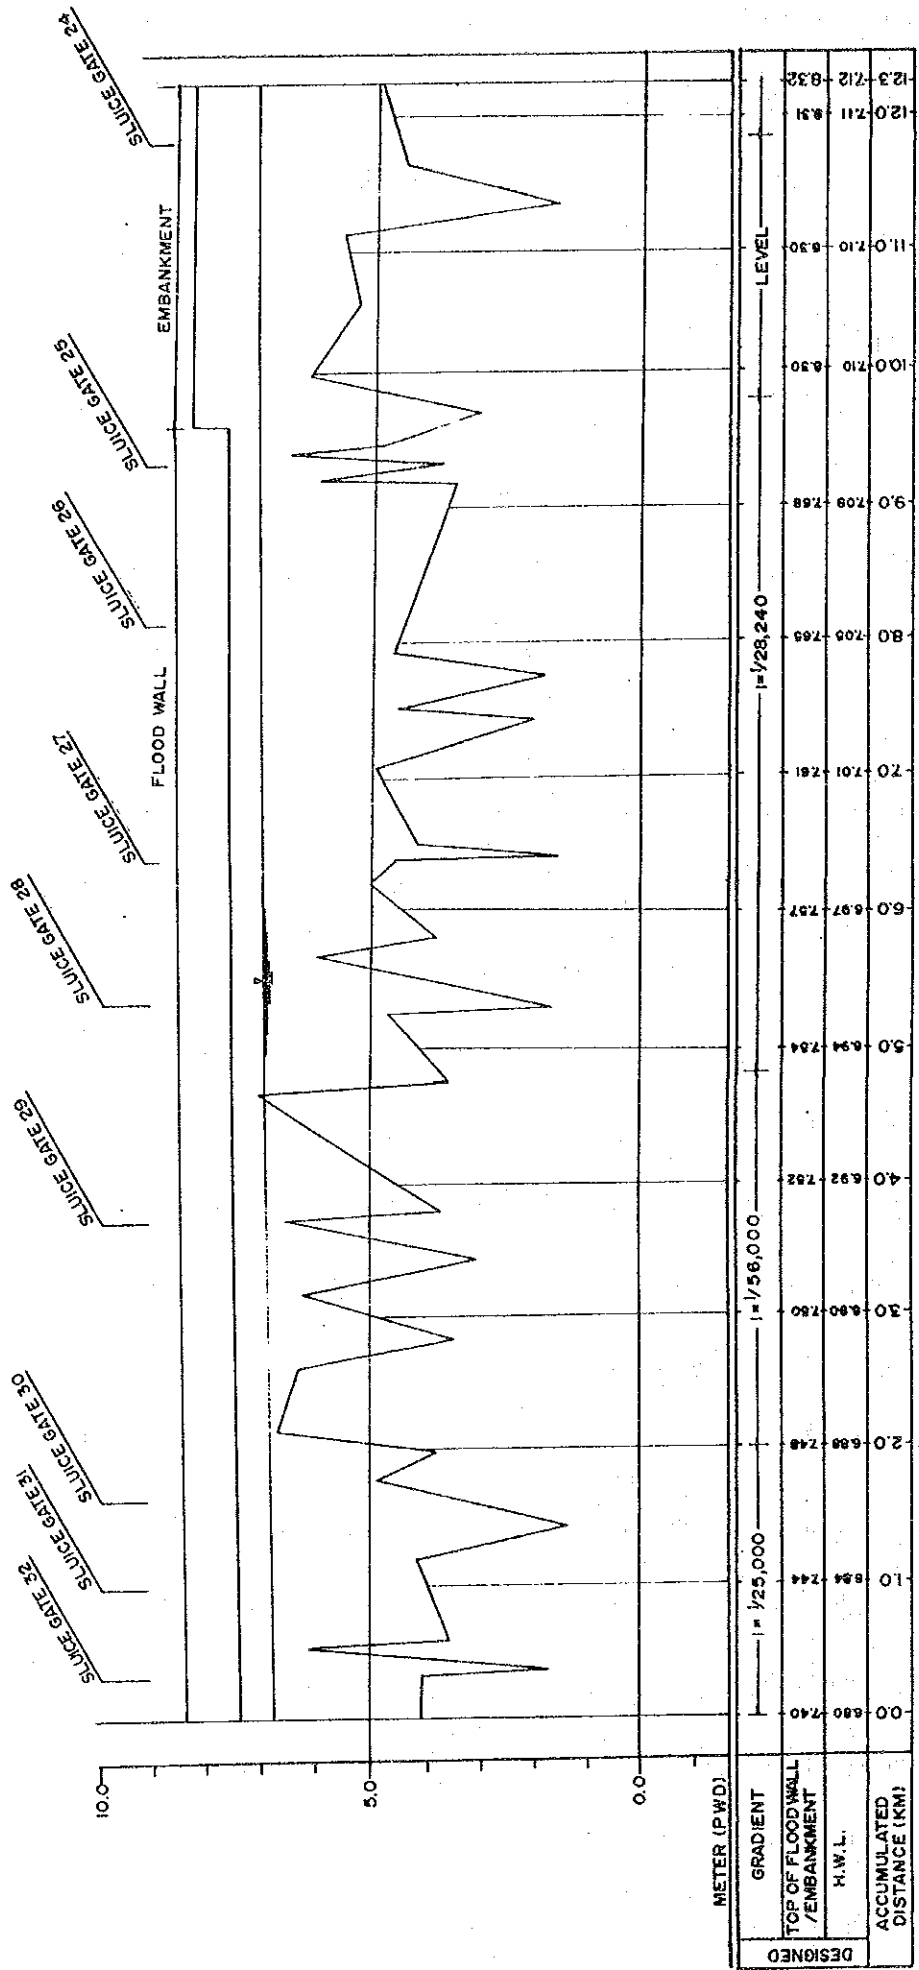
(2) LONGITUDINAL SECTION OF FLOOD WALL/EMBANKMENT (NE-1): NARAYANGANJ WEST
